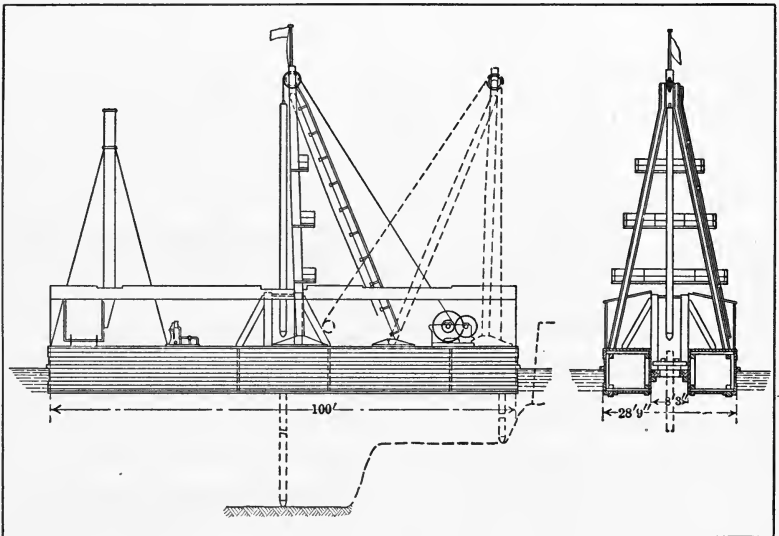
Side elevation and cross-section of Lobnitz rock cutter.
